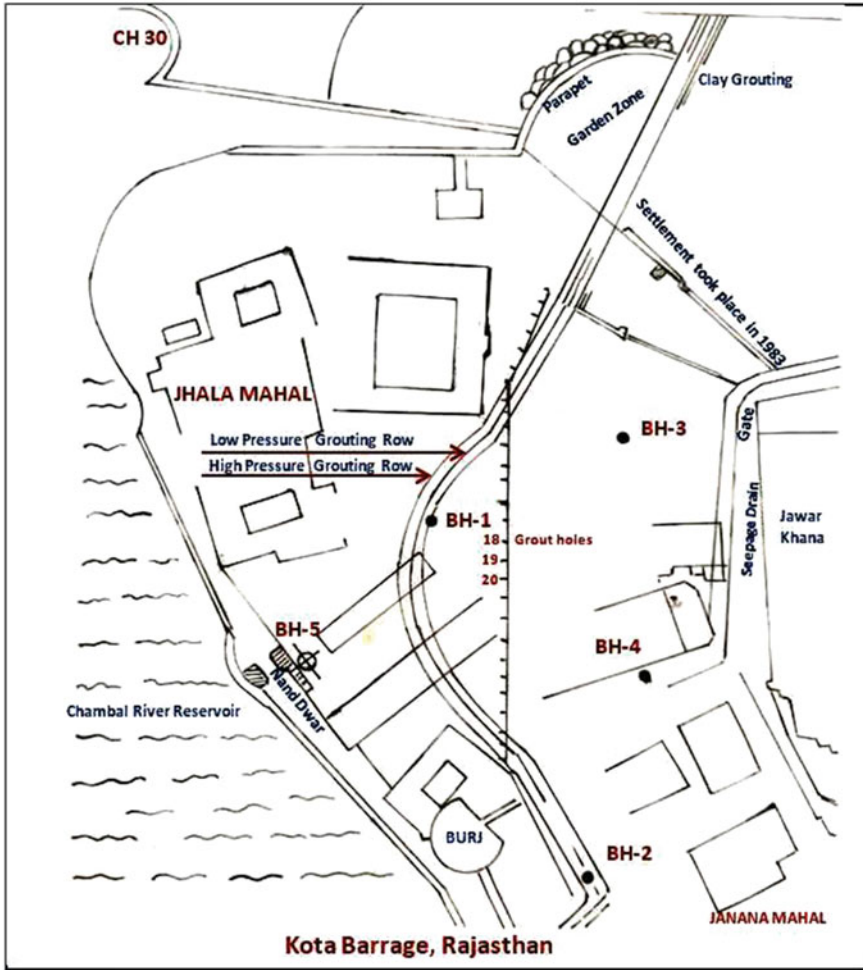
Layout of Kota Barrage, Rajasthan, showing the details of tracer studies
